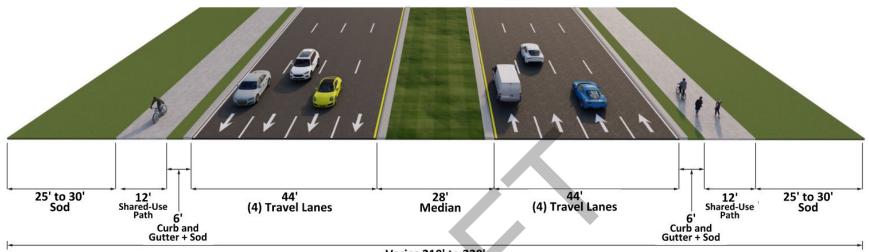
Alternative A – North Leg of US 41 and Bonita Beach Road Intersection
